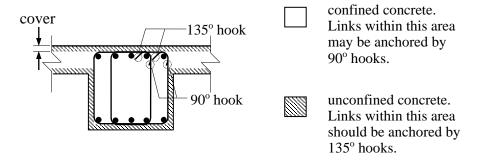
Reinforcement requirements for beams confined with slabs (same as Fig. 3.9)
